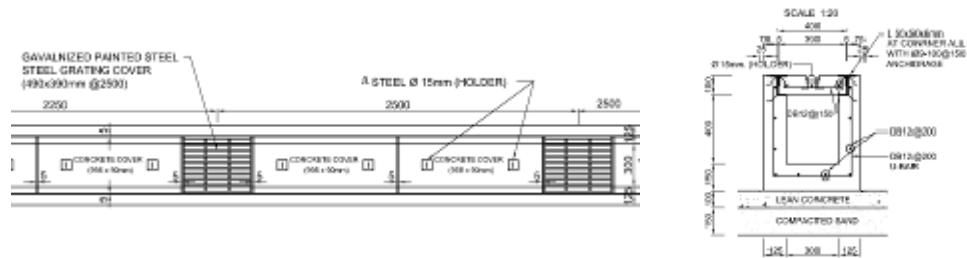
General Plan and Typical Section of the R.C. U-Gutter
